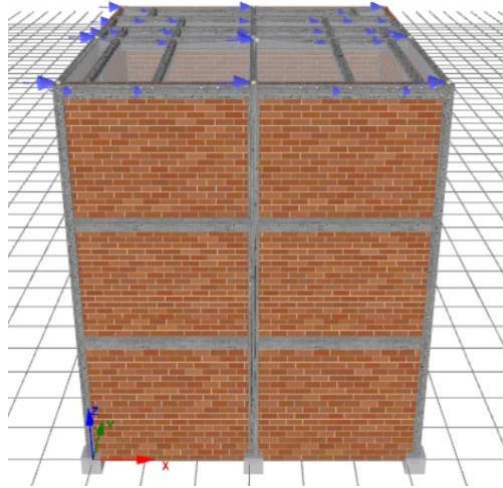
3D modeling of shophouse building structure with walls (model 2) using Seismostruct Software (Front View)
